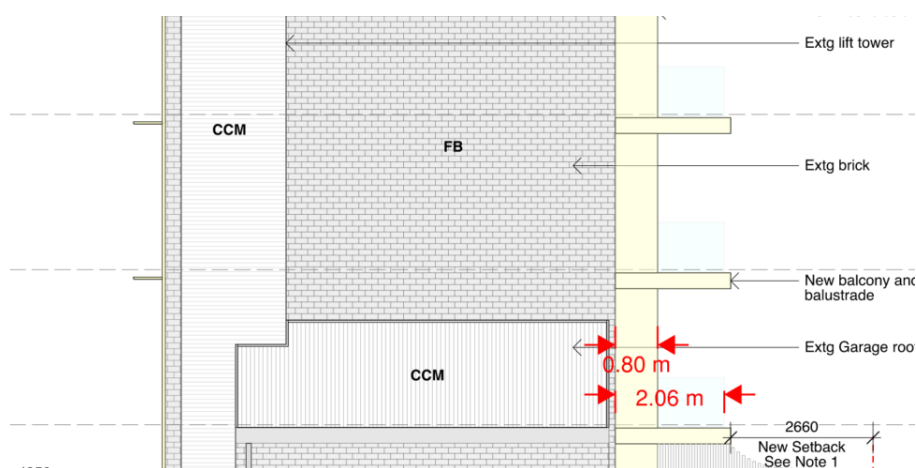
Proposed western elevation with Council markings in red – 10 Major Street, Coogee (Source: Ken Powell Architect)
